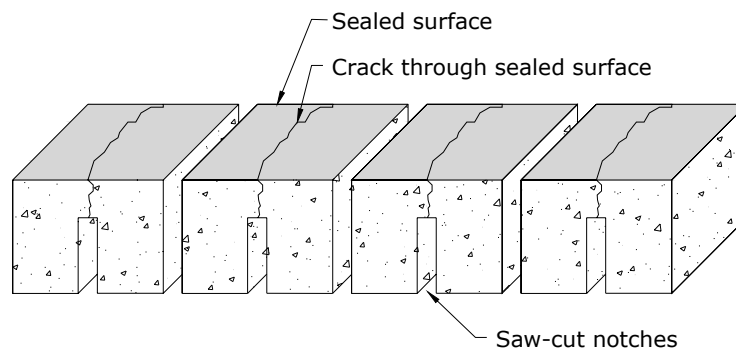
Depth of penetration specimen cut into four pieces and cracked through sealed surface
